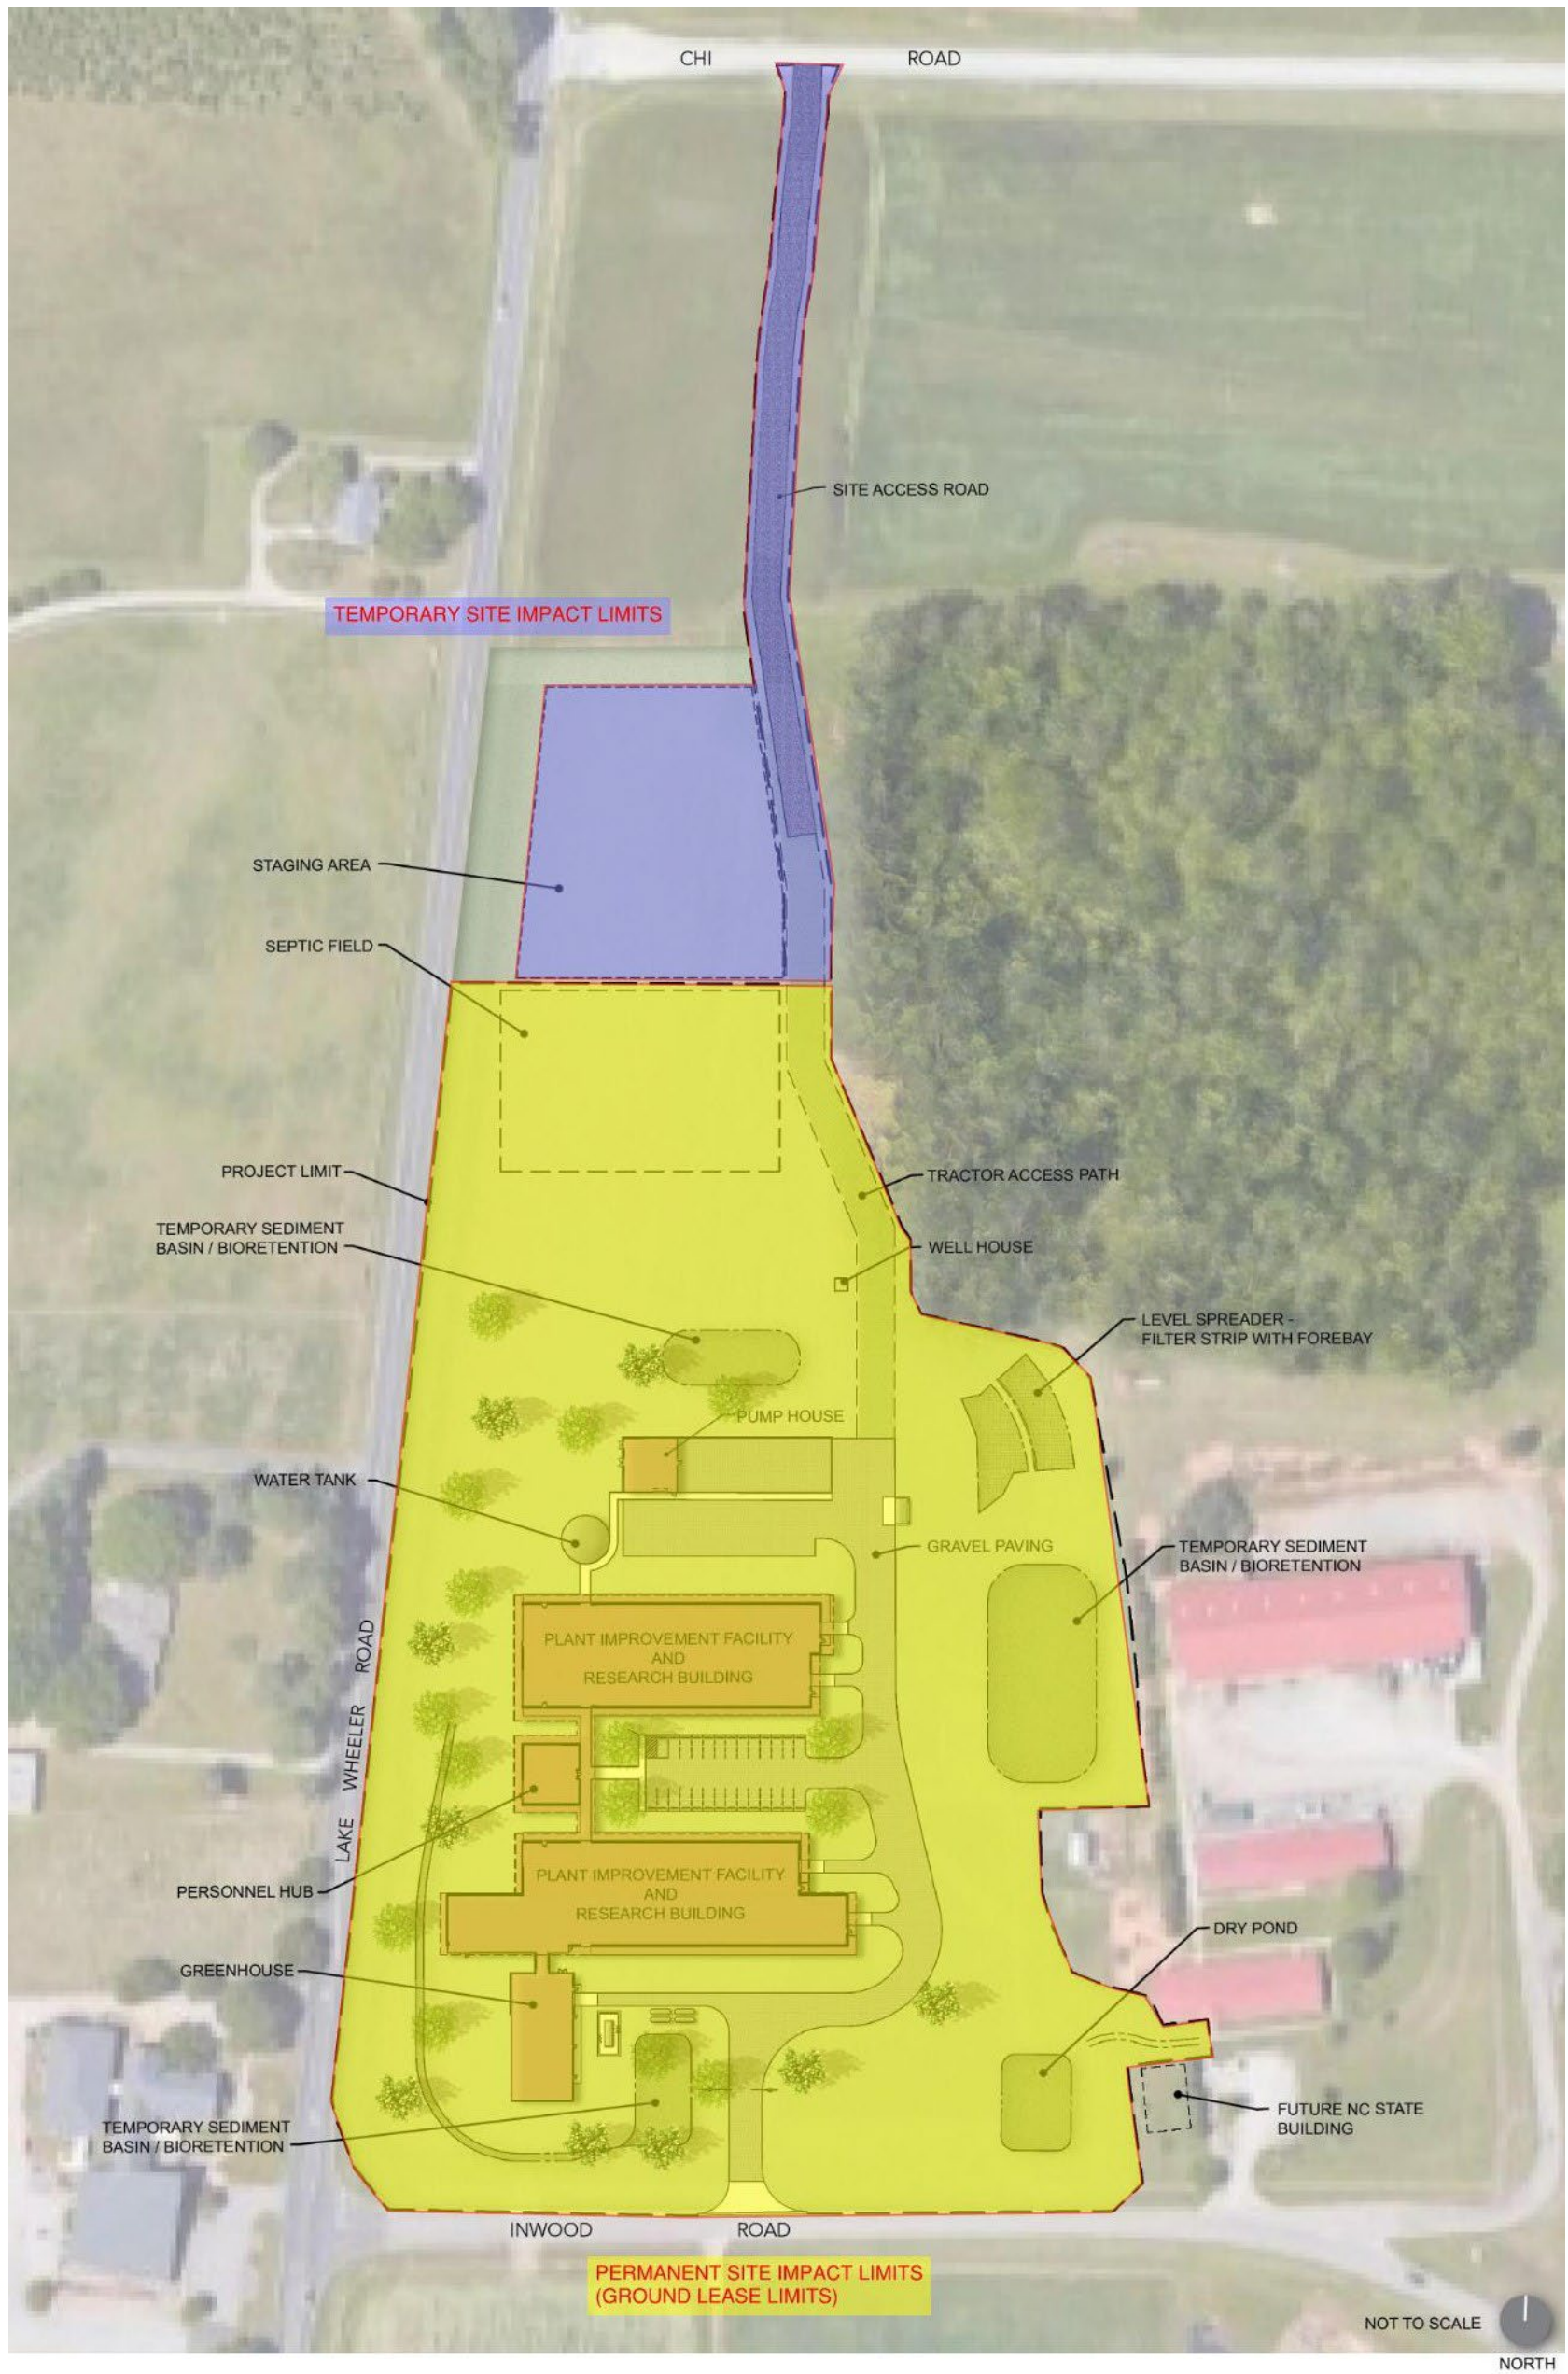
The proposed project limits of disturbance, including the temporary staging area and access road north of the project site.
